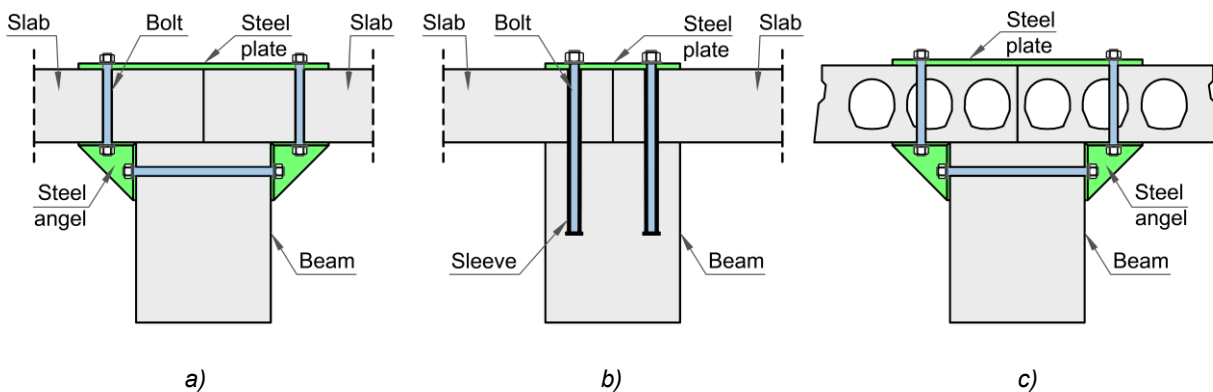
a) Solid slab-to-beam connection with bolts and steel plates and angles, b) solid slab-to-beam connection with bolts and steel plates and c) Hollow-core slab-to-beam connection with bolts and steel plates - adapted from [23]–[25]
